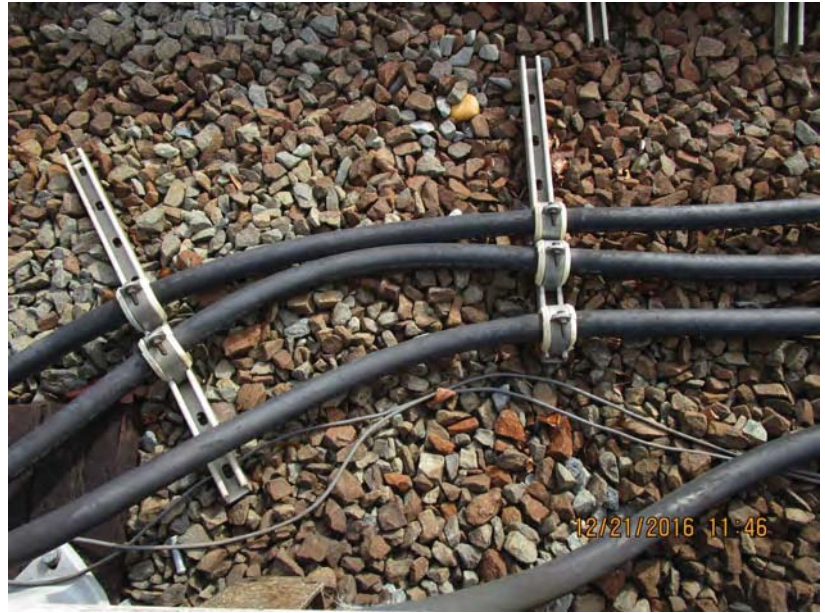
CABLES LAYING ON DECK (BALLAST) f
